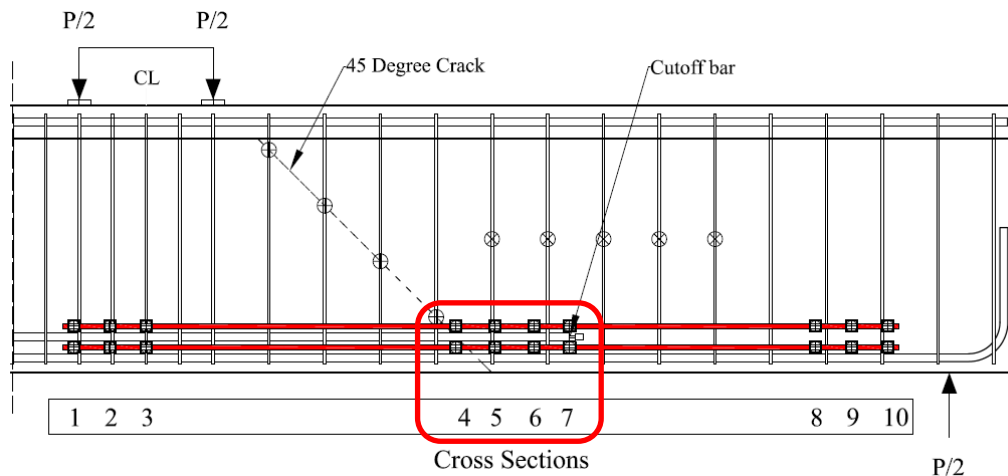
Labeling convention of cross sections in typical T-specimen
